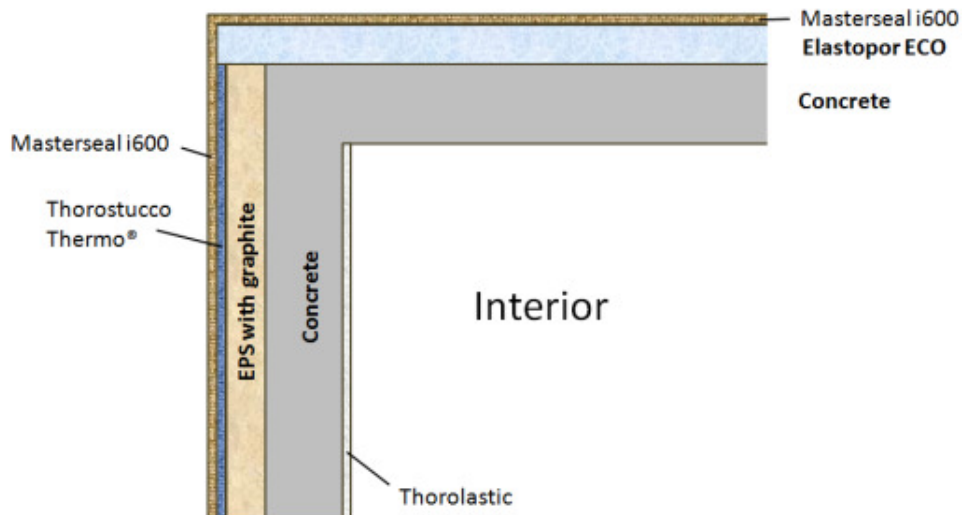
Wall and roof/ceiling mounting of Urbi Villa del Rey. Elaborated by means of Mayagoitia, 2012
